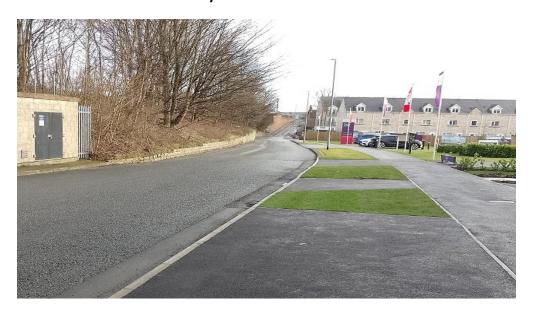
Pit Lane looking back towards junction with Old Great North Road – footway on level crossing side of Pit Lane ends at substation on left of photo.
